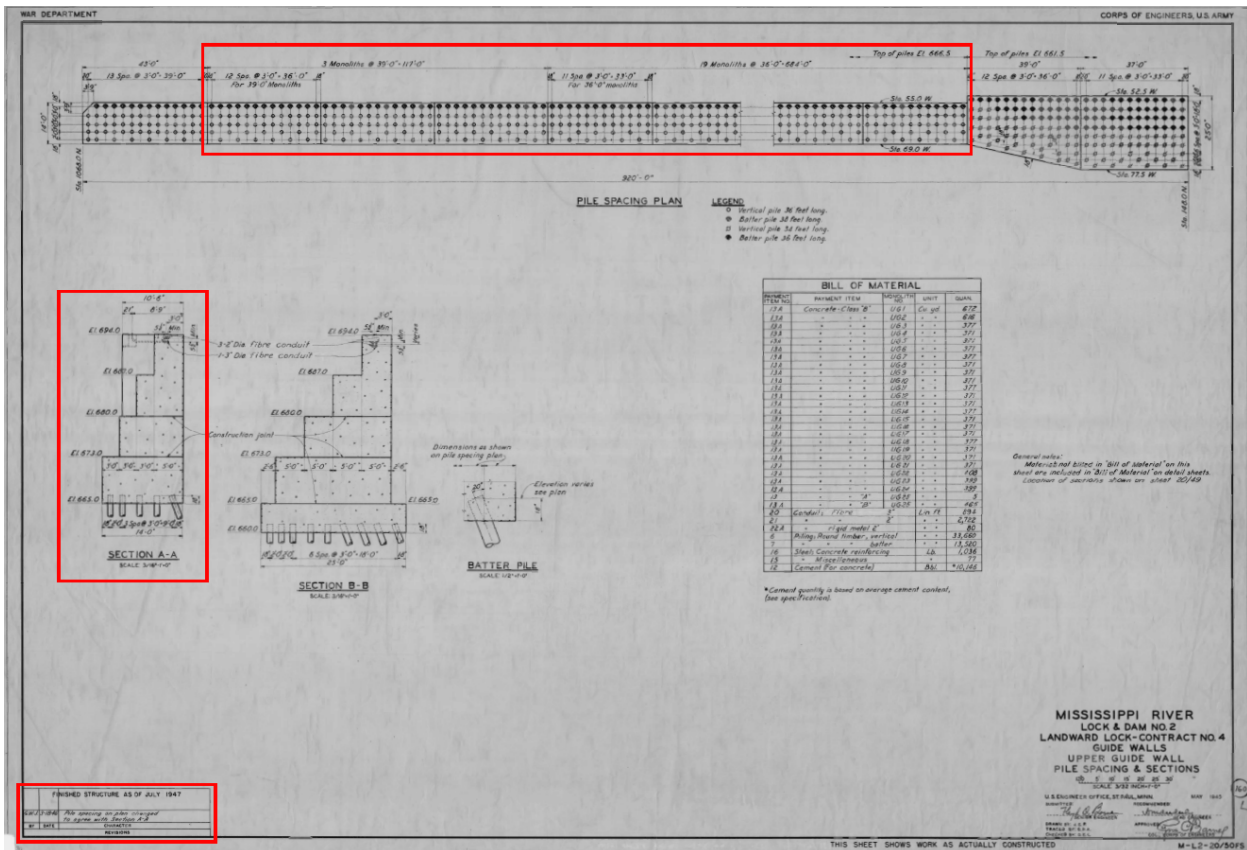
As built plans of upper pool interior monoliths at MRLD2 (Source: U.S. Army Corps of Engineers)
